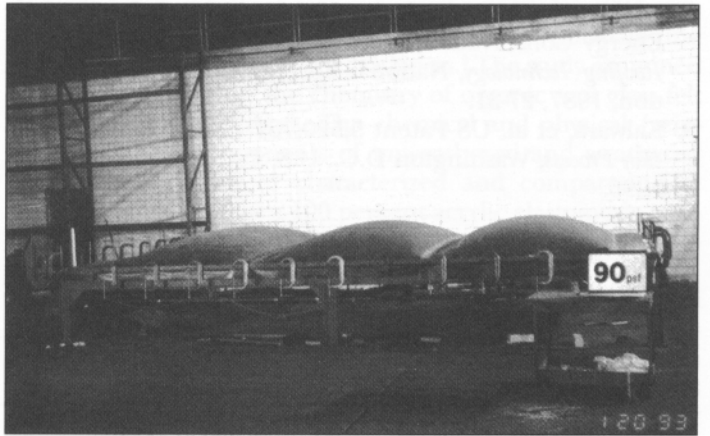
Wind uplift test in progress on 3.7- by 7.3-m (12- by 24-foot) apparatus.
